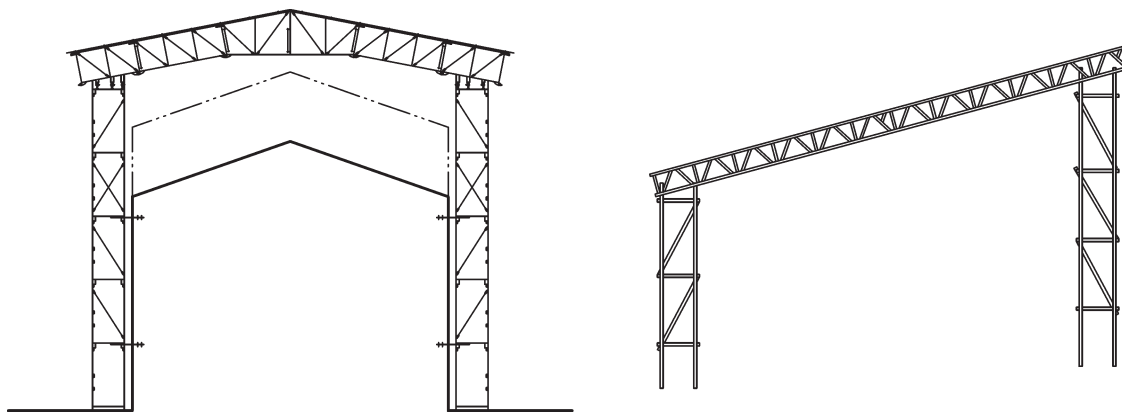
Examples of temporary roofs supported by scaffolding elements
